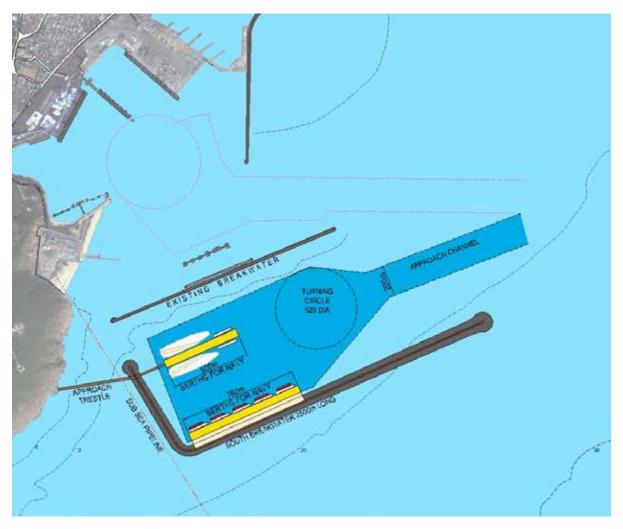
Proposed Outer Harbour - Layout Plan Alternative 1
